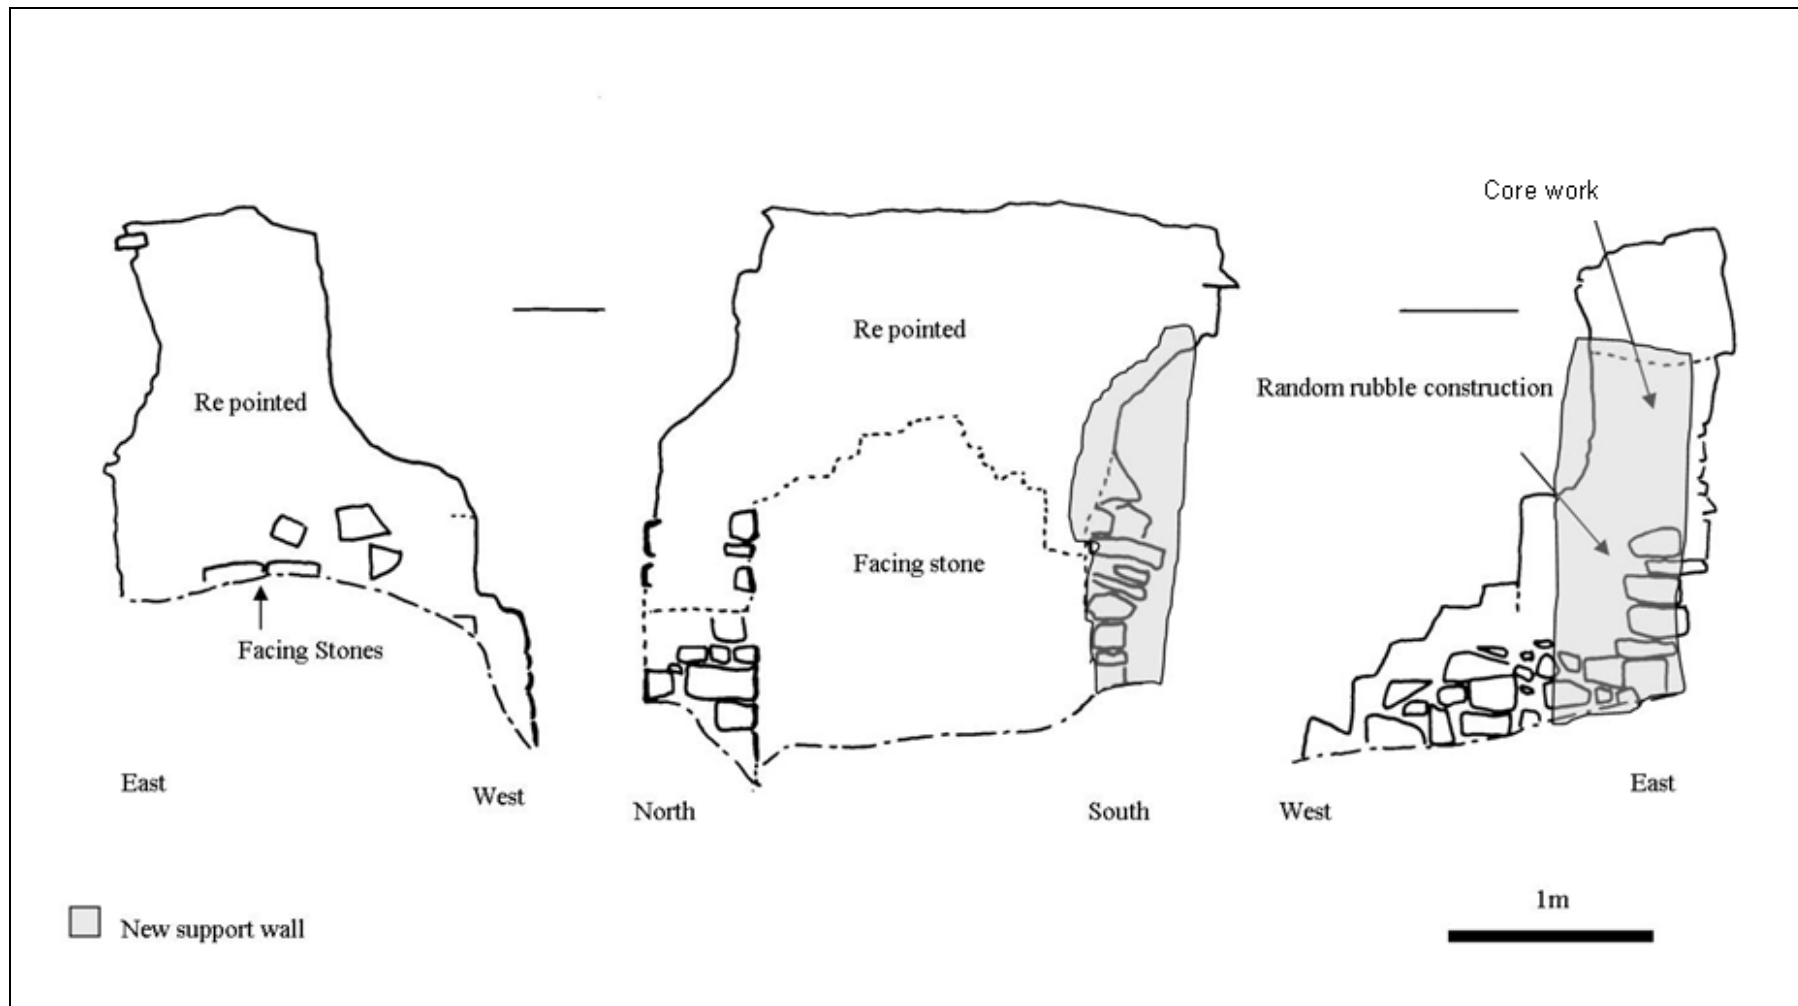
Elevations showing the repaired stair tower and the new support wall.
